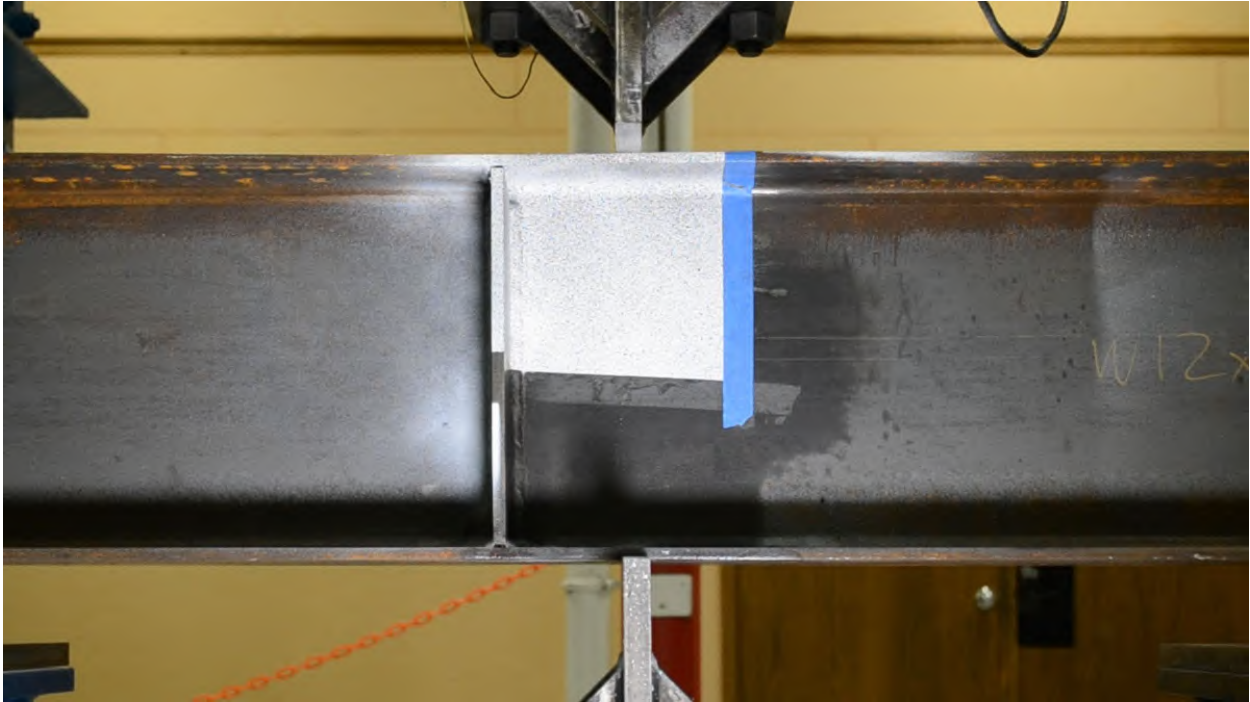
Elevation view of W12X26-DC-NA after testing
